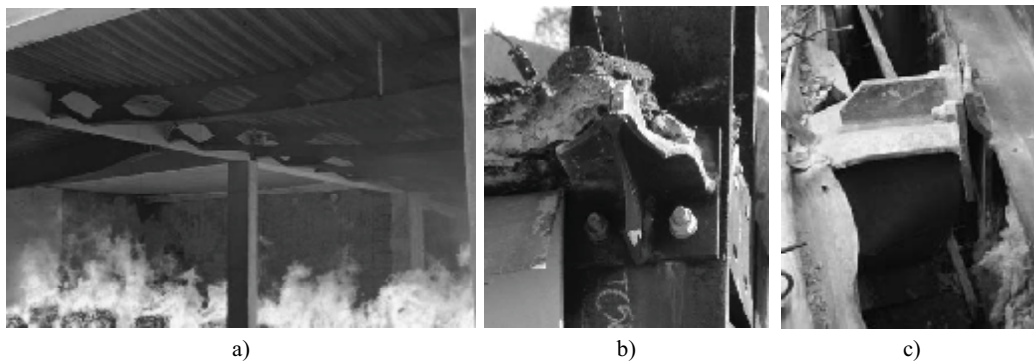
a) Deflections of the structure in 58 min, b) the beam to column connection after the test, c) the deformation of the end plate of the beam to beam connection
